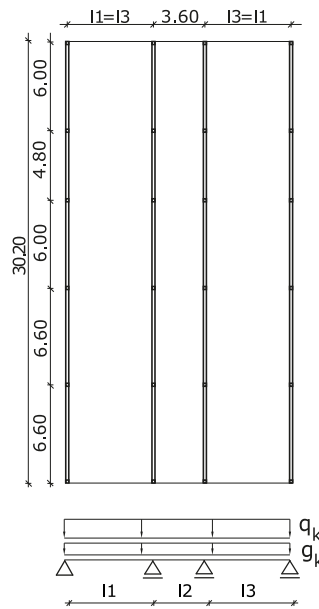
Geometric configuration of the floor slab systems (schematic).
